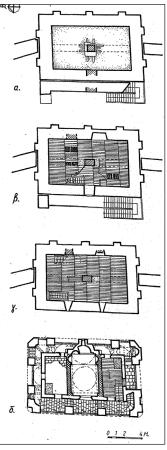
Plans of the tower of St Sava (P. Androudis):
